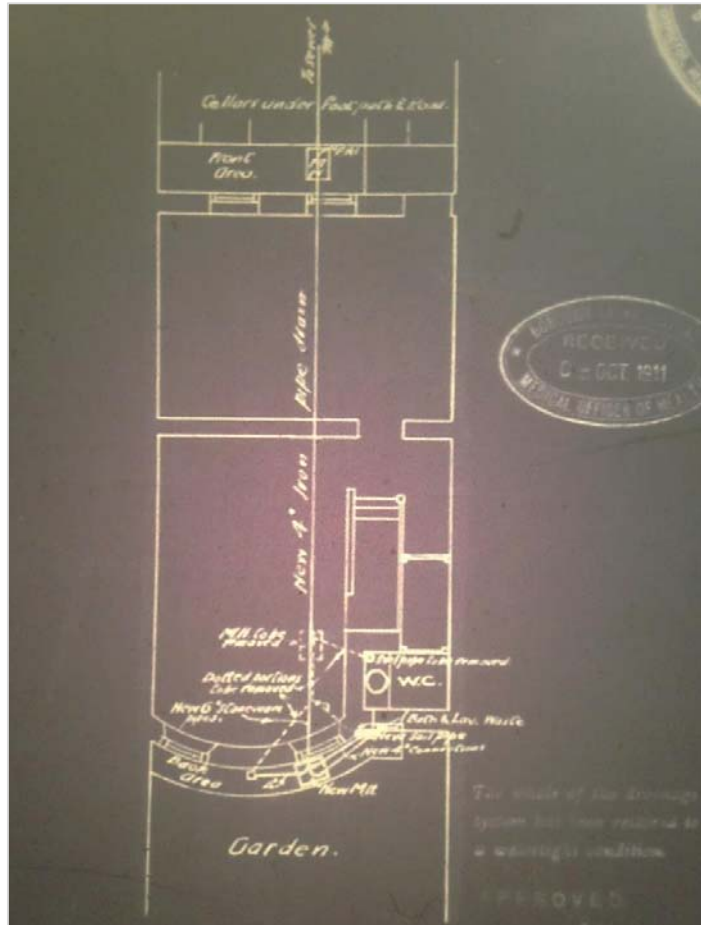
1911 drainage plan: lower ground floor¹³
